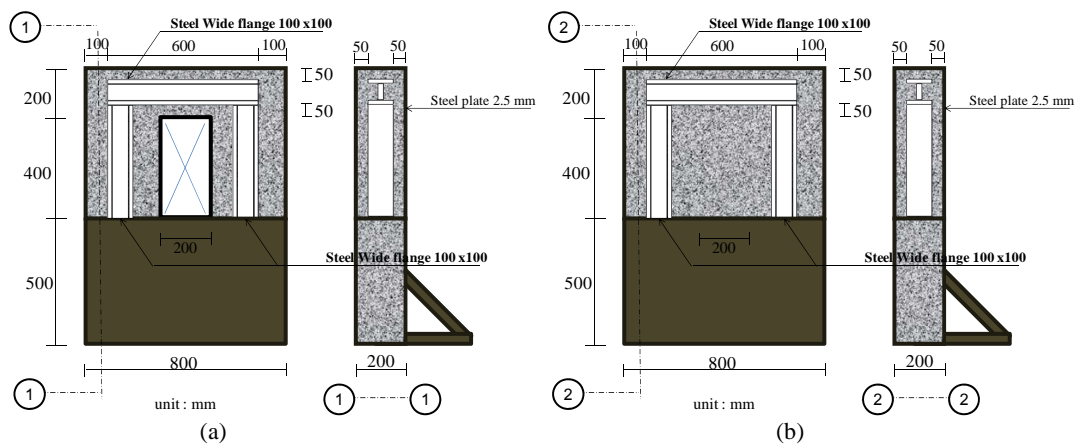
Supports for the specimen: (a) with ventilation opening (b) without ventilation opening
